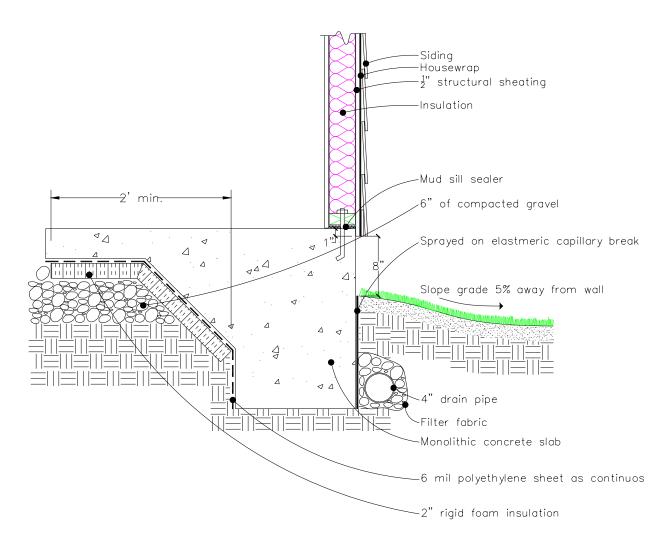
Insulating below a slab-on-grade foundation at the perimeter prevents heat loss in the slab area where it is most likely to occur
